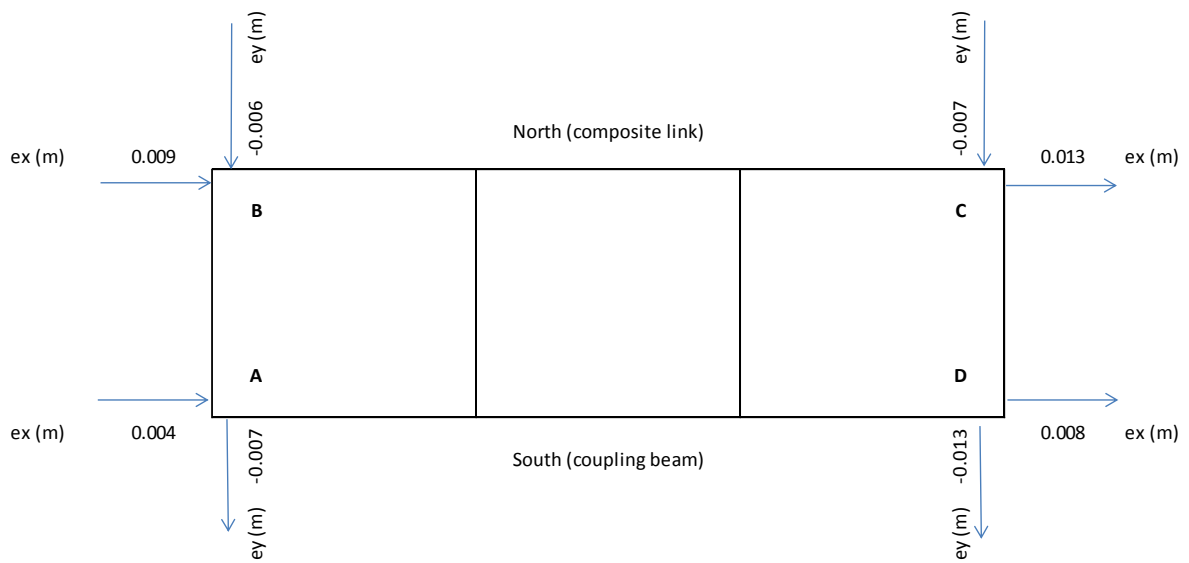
Out of plumb, 2nd measurement, 2nd floor
